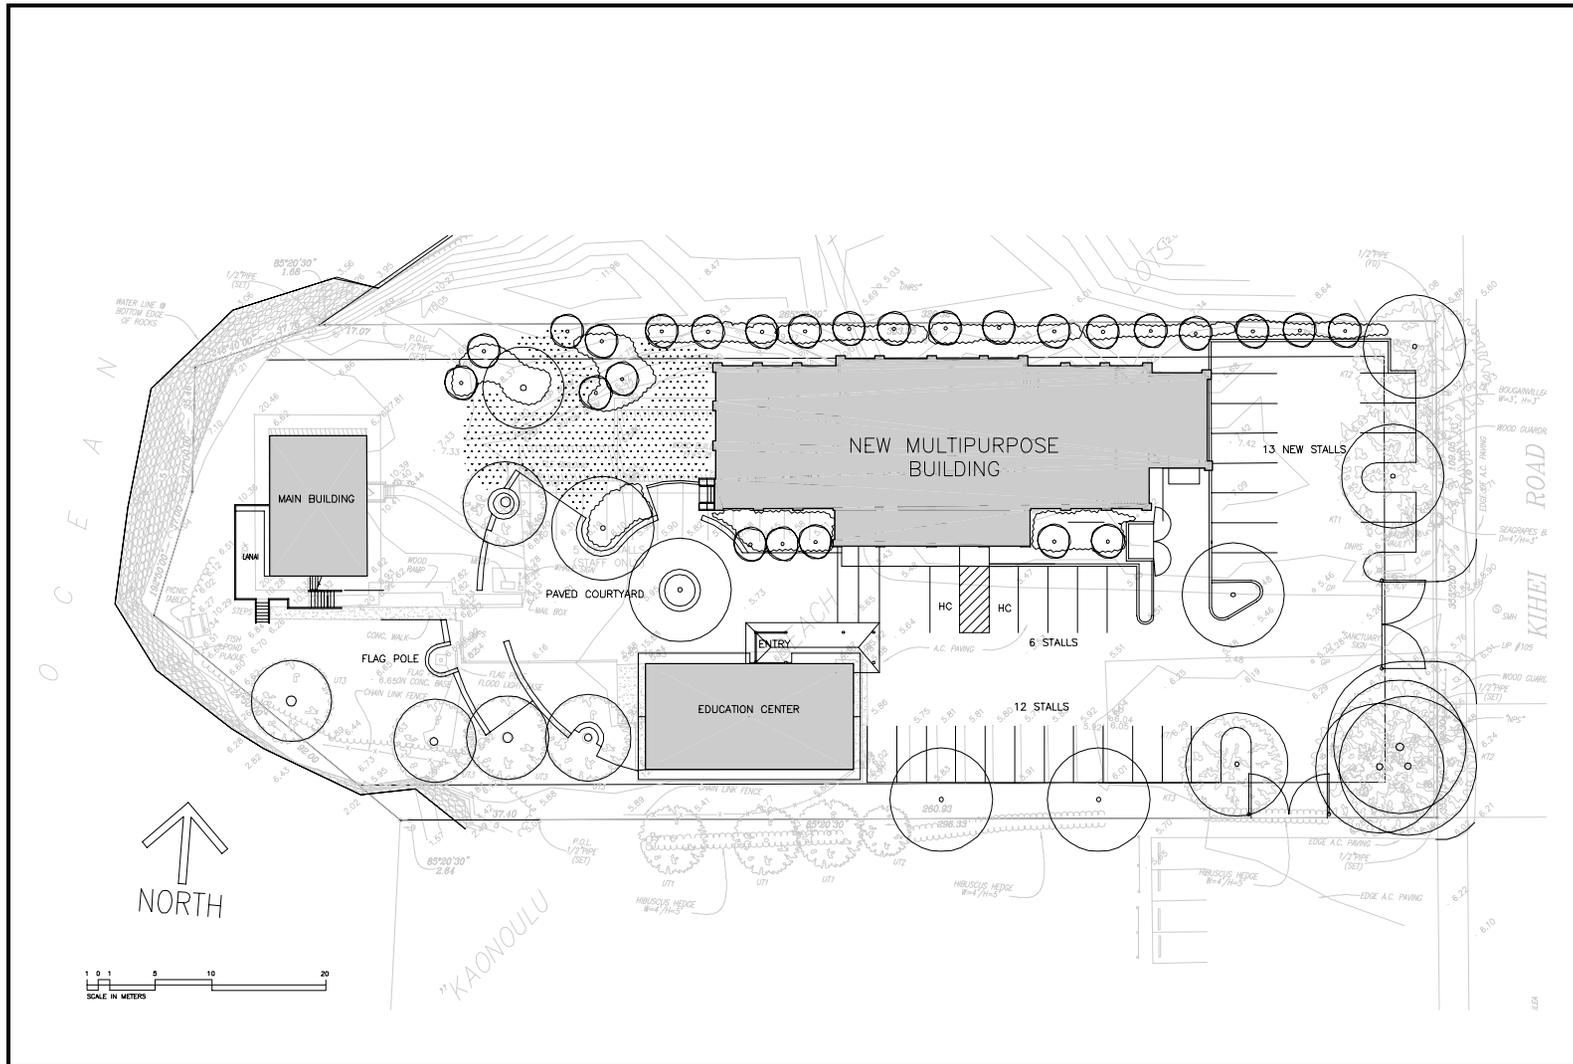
Site Plan of Proposed Multi-purpose Building. (Architects Pacific, Inc.)
